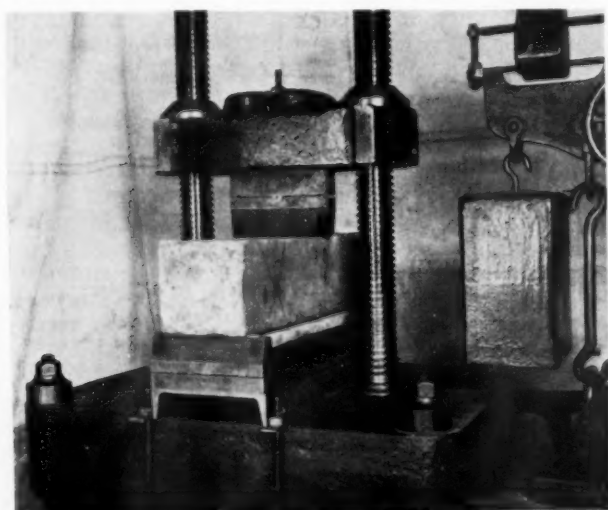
SPECIMEN SET UP IN TESTING MACHINE, LOAD APPLIED AT CENTER OF SPAN
